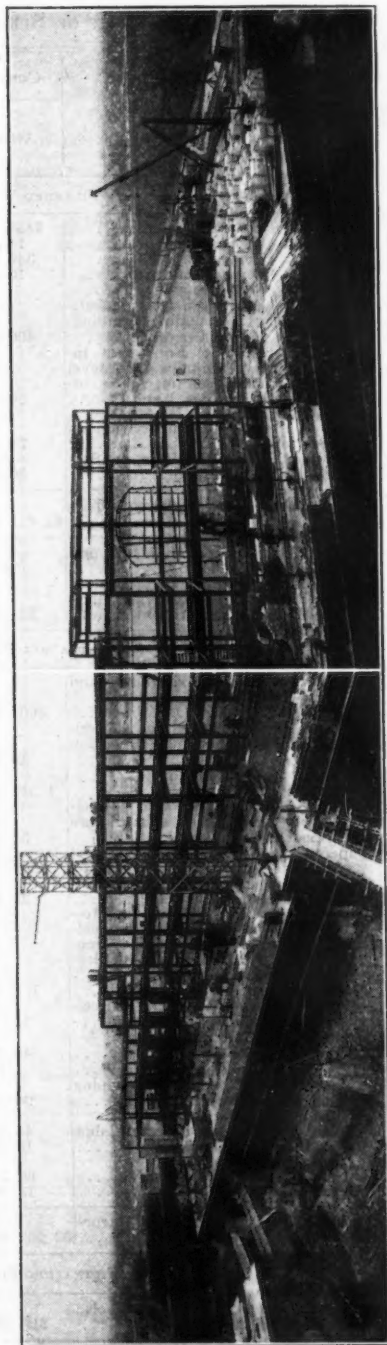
CHEMICAL BUILDING STEEL WORK ERECTED
